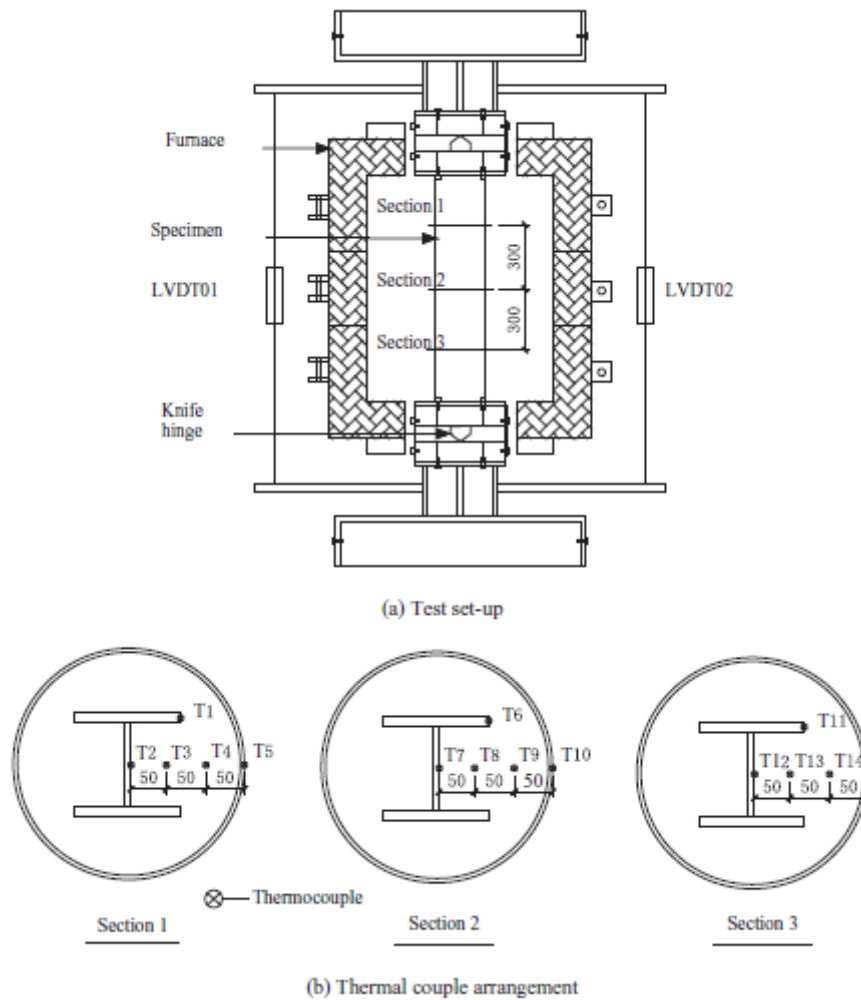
5 - Schematic diagram of test setup and layout of instrumentations (Zhou et al., 2019).
